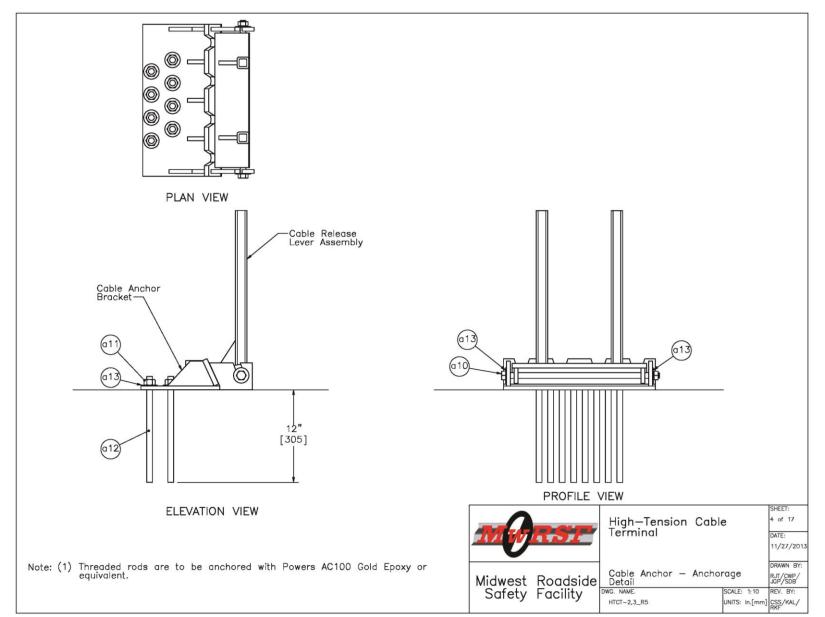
Cable Anchor Anchorage Detail, Test Nos. HTCT-2 and HTCT-3
